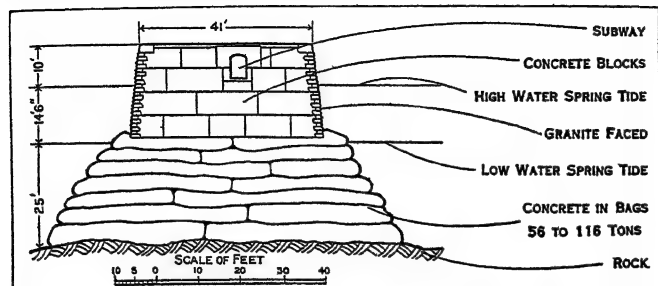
CROSS SECTION OF TYNE NORTH PIER AS RECONSTRUCTED, 1899-1908
